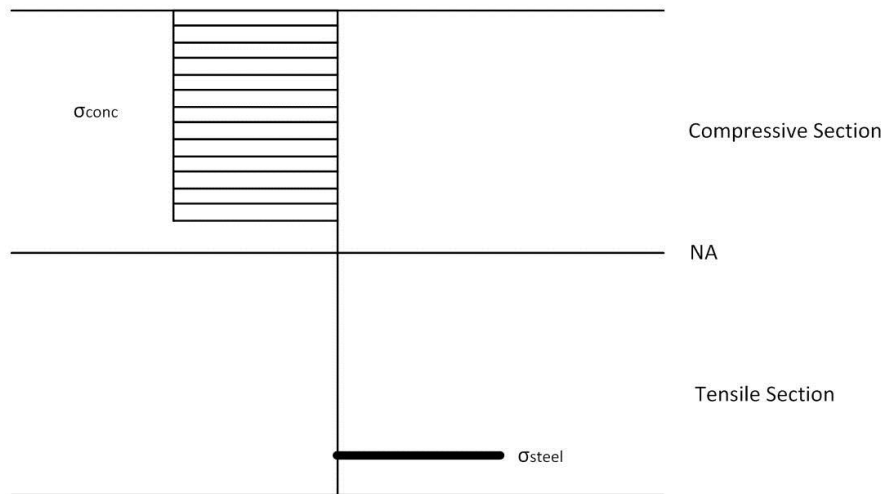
Section at mid-span of a conventionally reinforced concrete beam in flexure.
